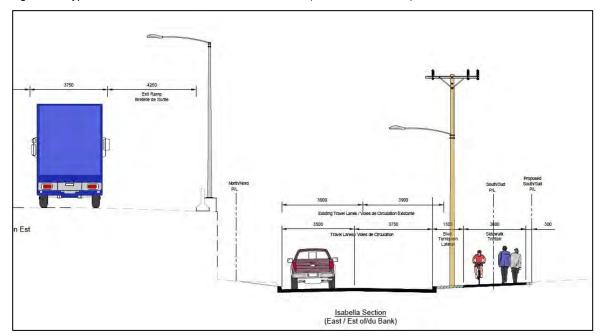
Typical Cross-section – Isabella Street Renewal (East of Bank Street)
